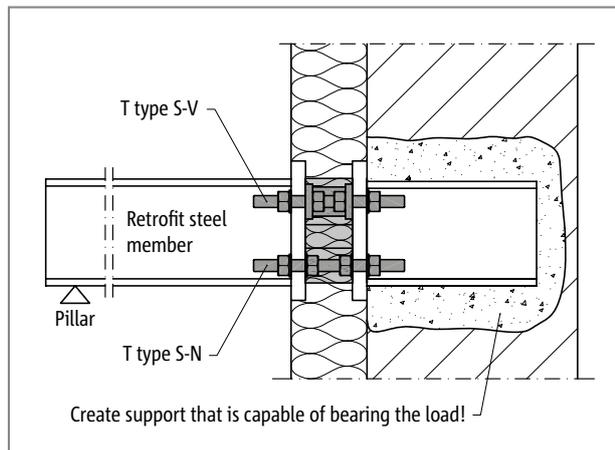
Schöck Isokorb® T type S-N and T type S-V: for retrofitted supported steel structure; for further renovation examples see p. 96
